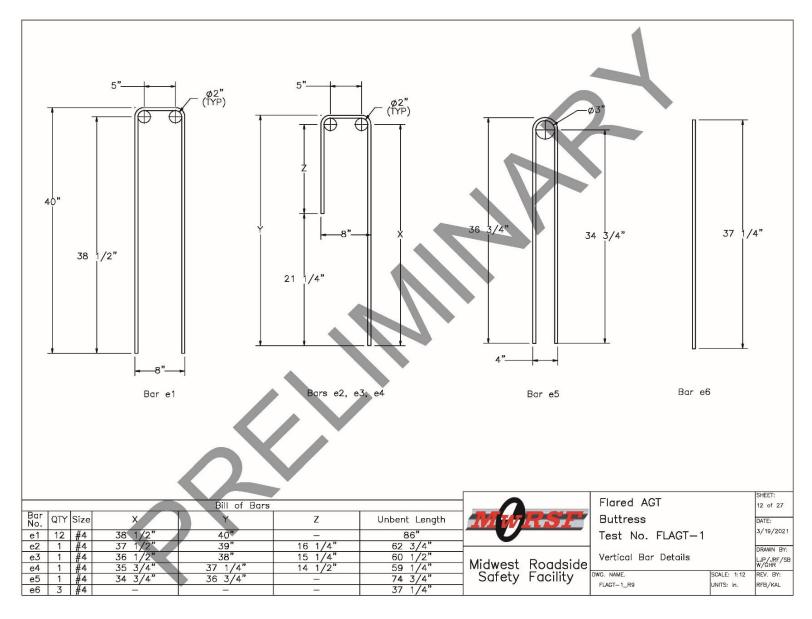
Vertical Rebar Details, Test No. FLAGT-1
